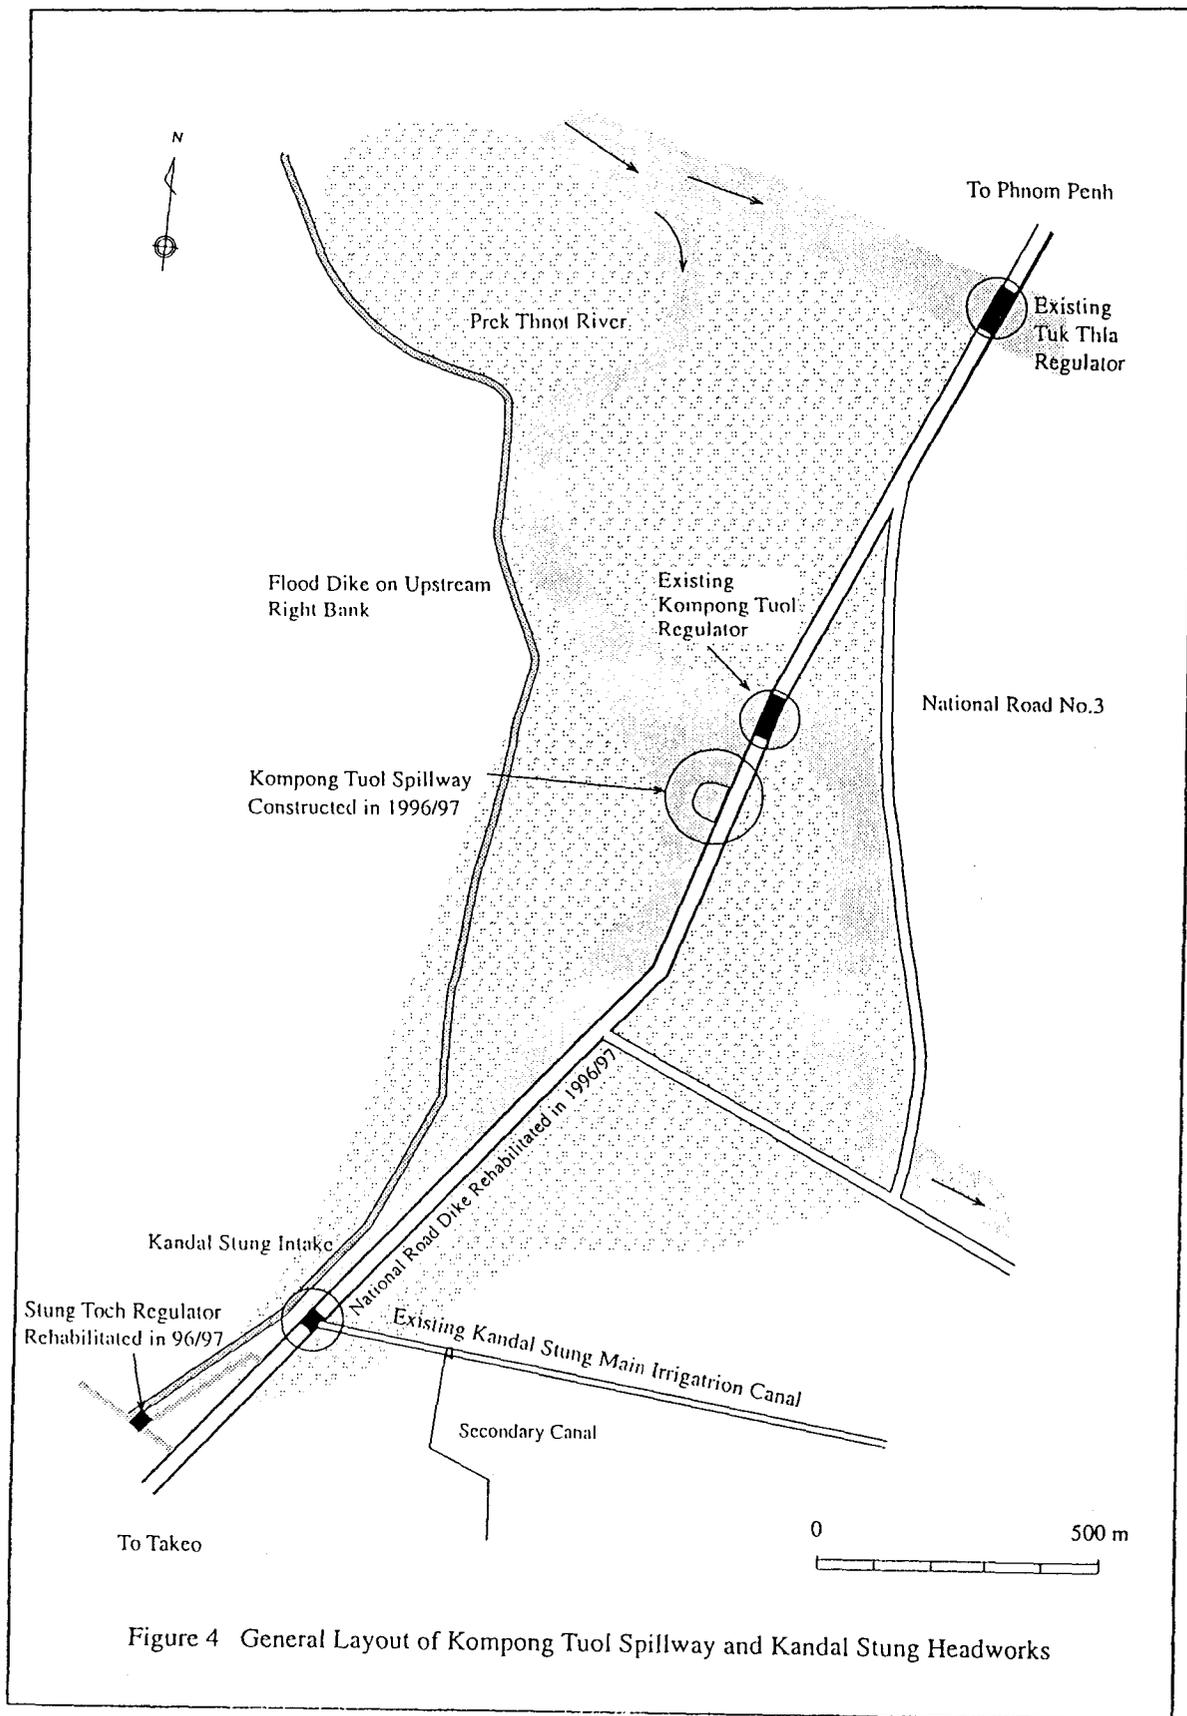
General Layout of Kompong Tuol Spillway and Kandal Stung Headworks
